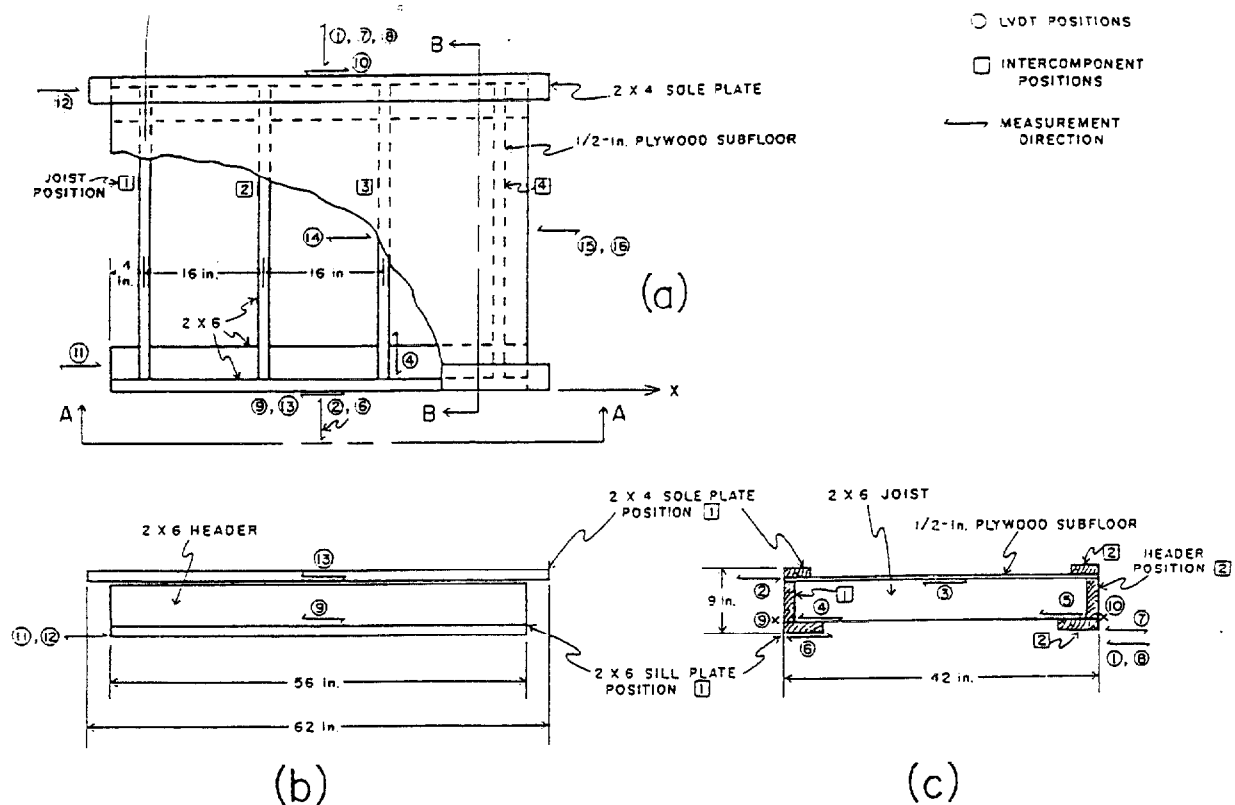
Typical Intercomponent Connection Specimen (after Polensek and Laursen, 1984).
